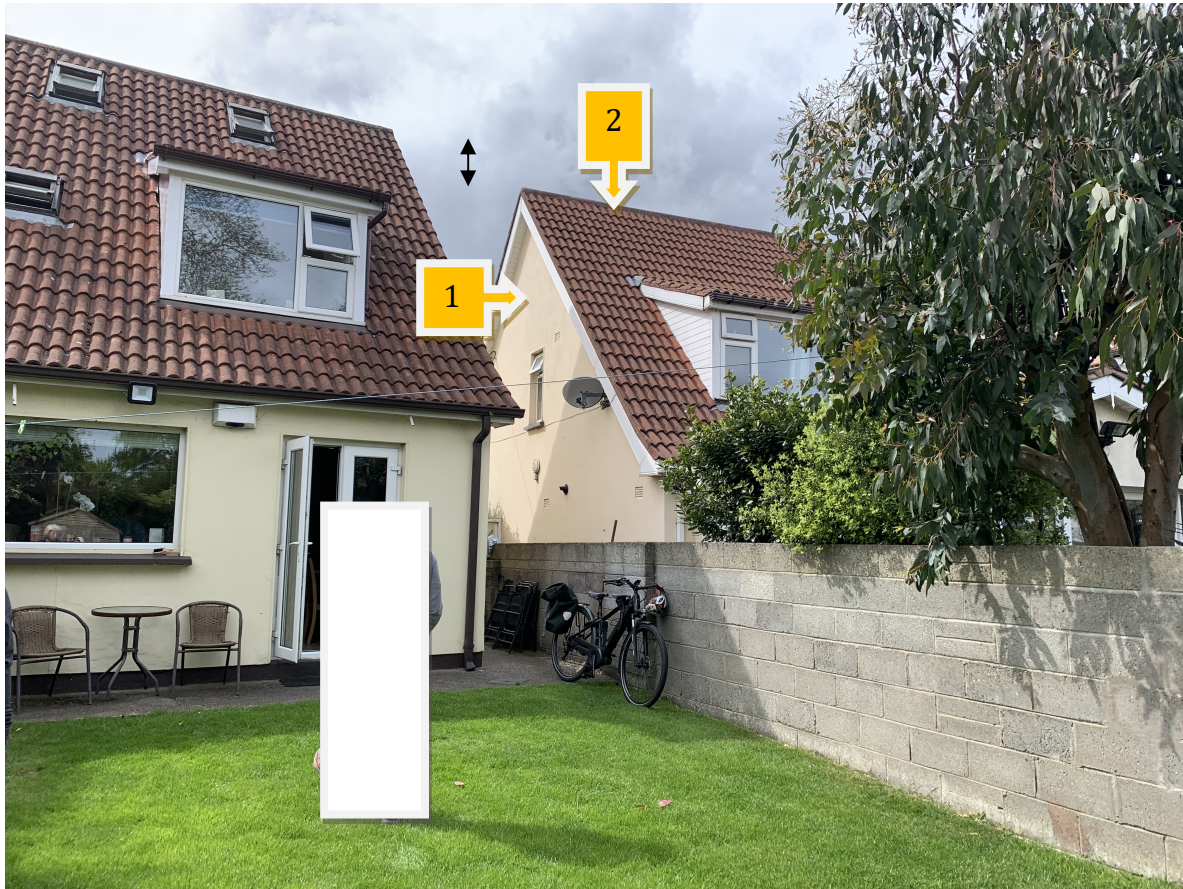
Rear elevation of no 7 Templeroan Lodge showing location of 1. Proposed apex gable window 2. Height of proposed flat roofed attic extension 3. Level difference between number 6 and 7 Templeroan Lodge.
